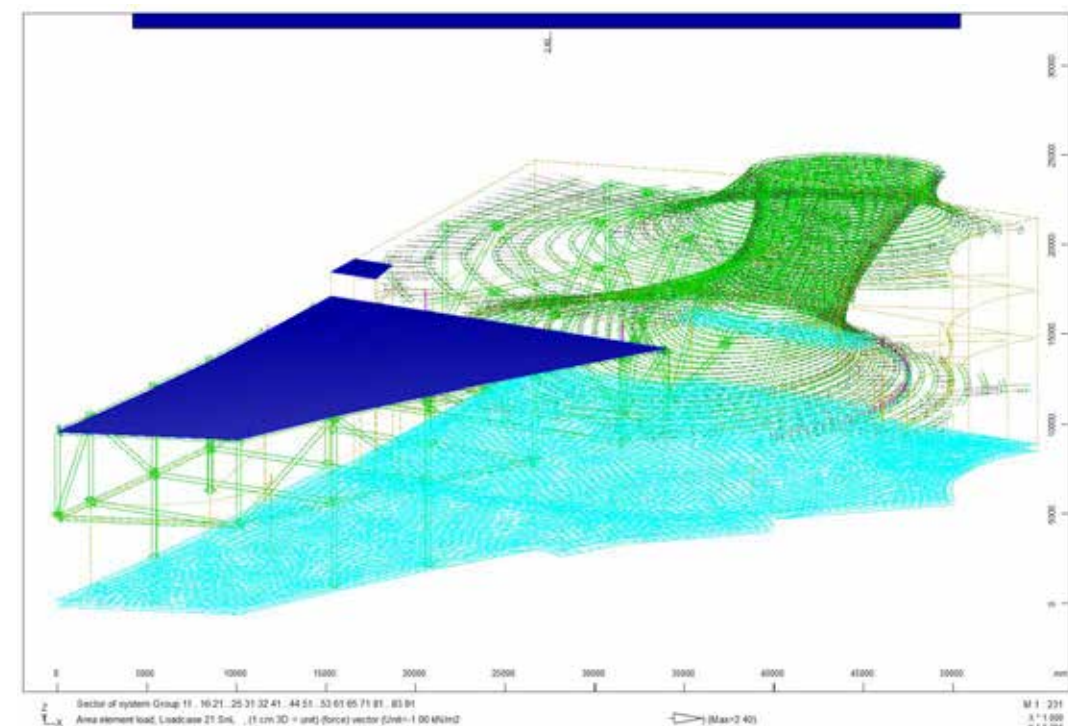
LL loads on area elements: office floor and auditorium floor (3,00 kPa ; 5,00 kPa)
